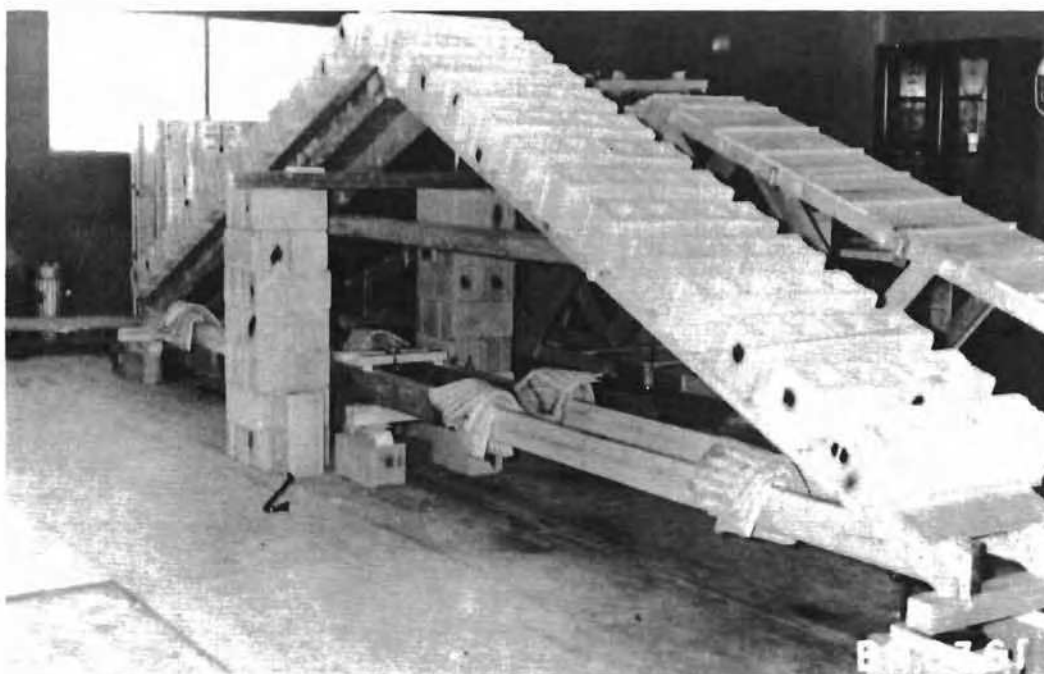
Photo showing conventional construction loaded with 40 p.s.f. snow load (foreground).
